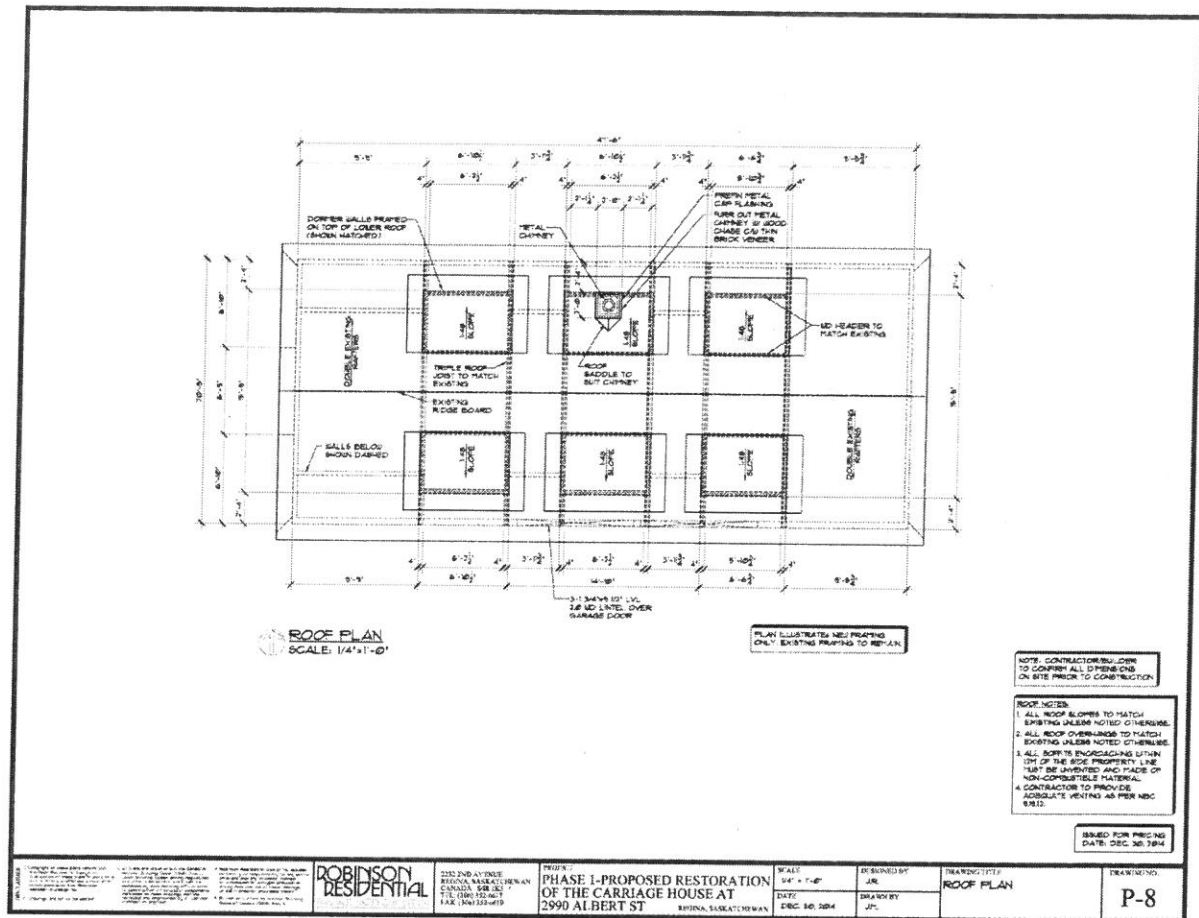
The roof plan of the carriage house after the proposed rehabilitation.
